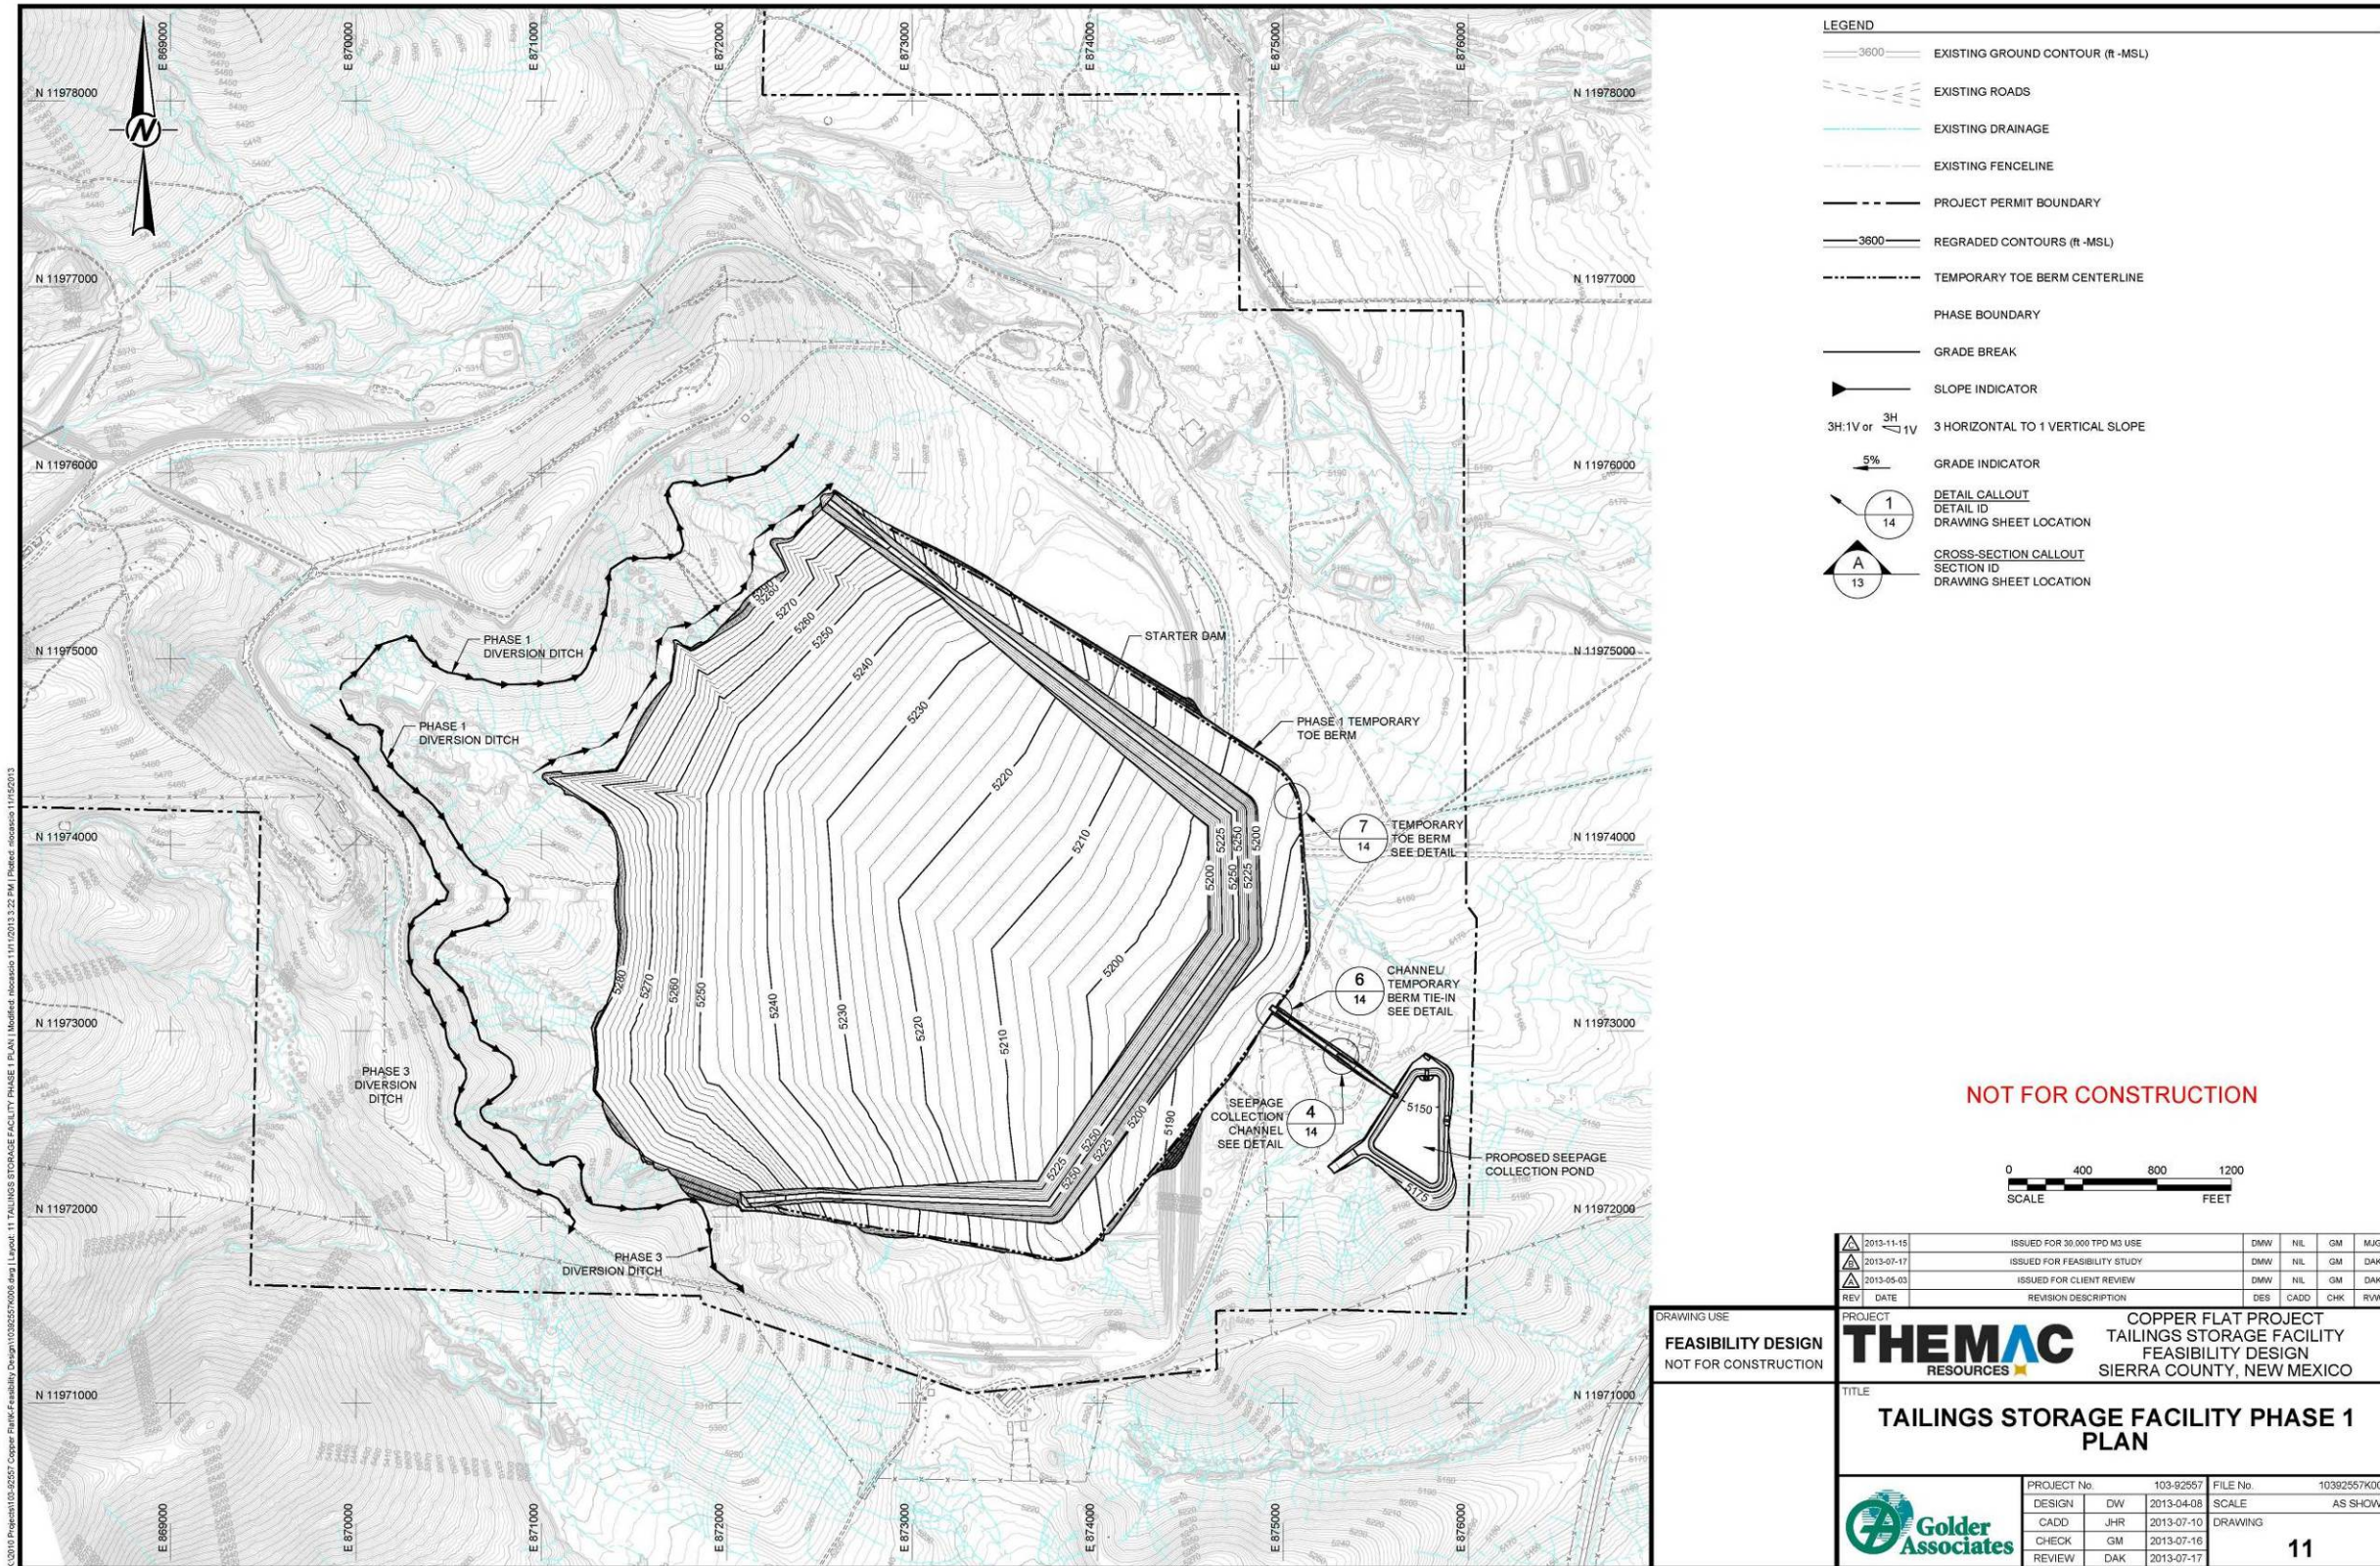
Tailings Storage Facility Grading Plan Phase 1
